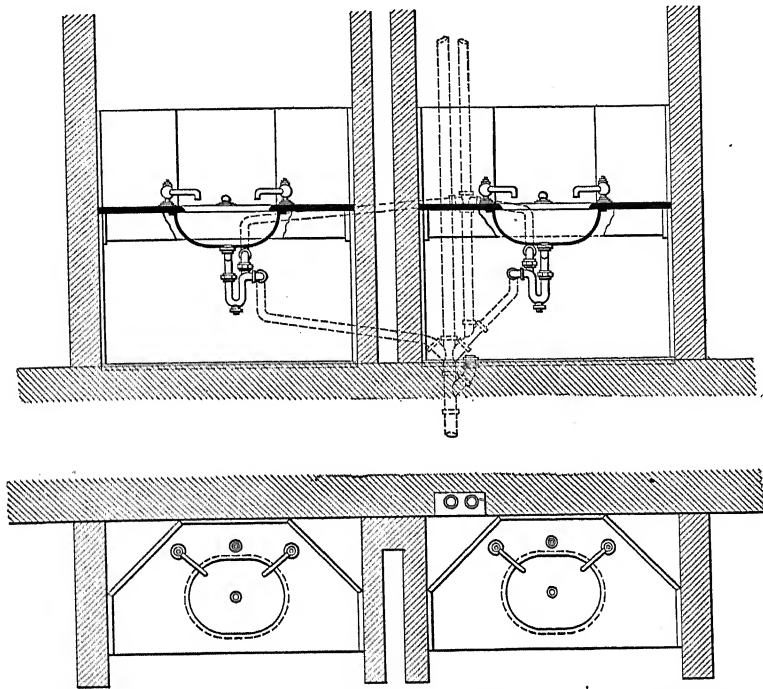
Plan and Section Showing Pipe Connections for Two Washstands.
